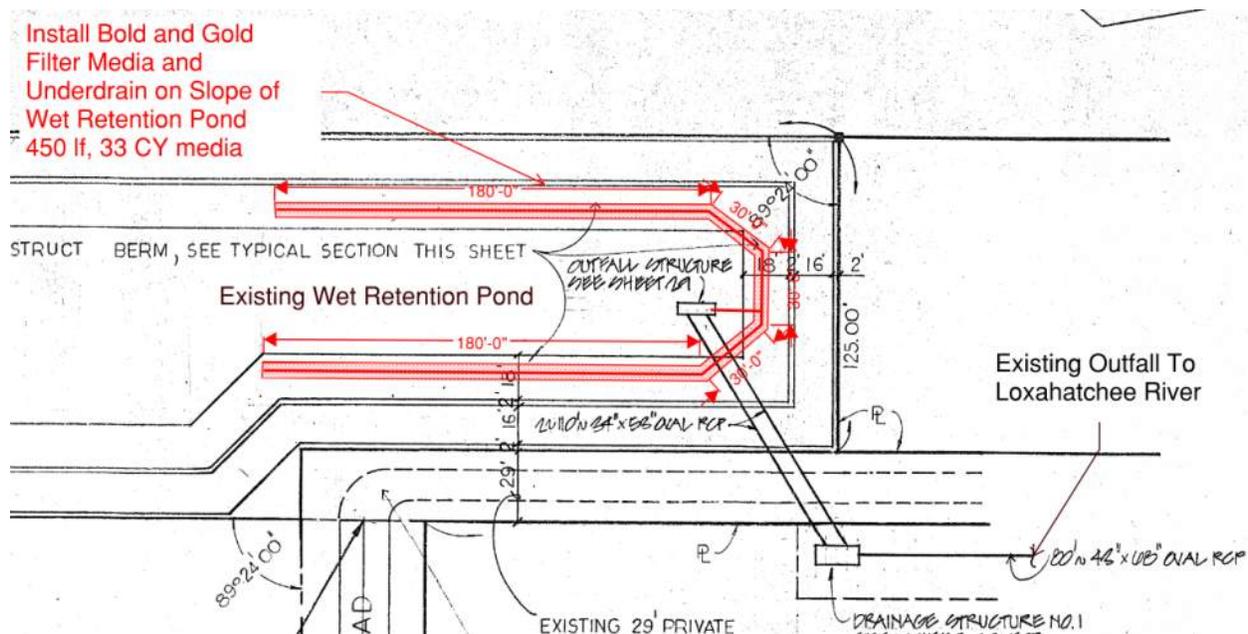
Proposed Improvements at Seminole Basin Wet Retention Pond
